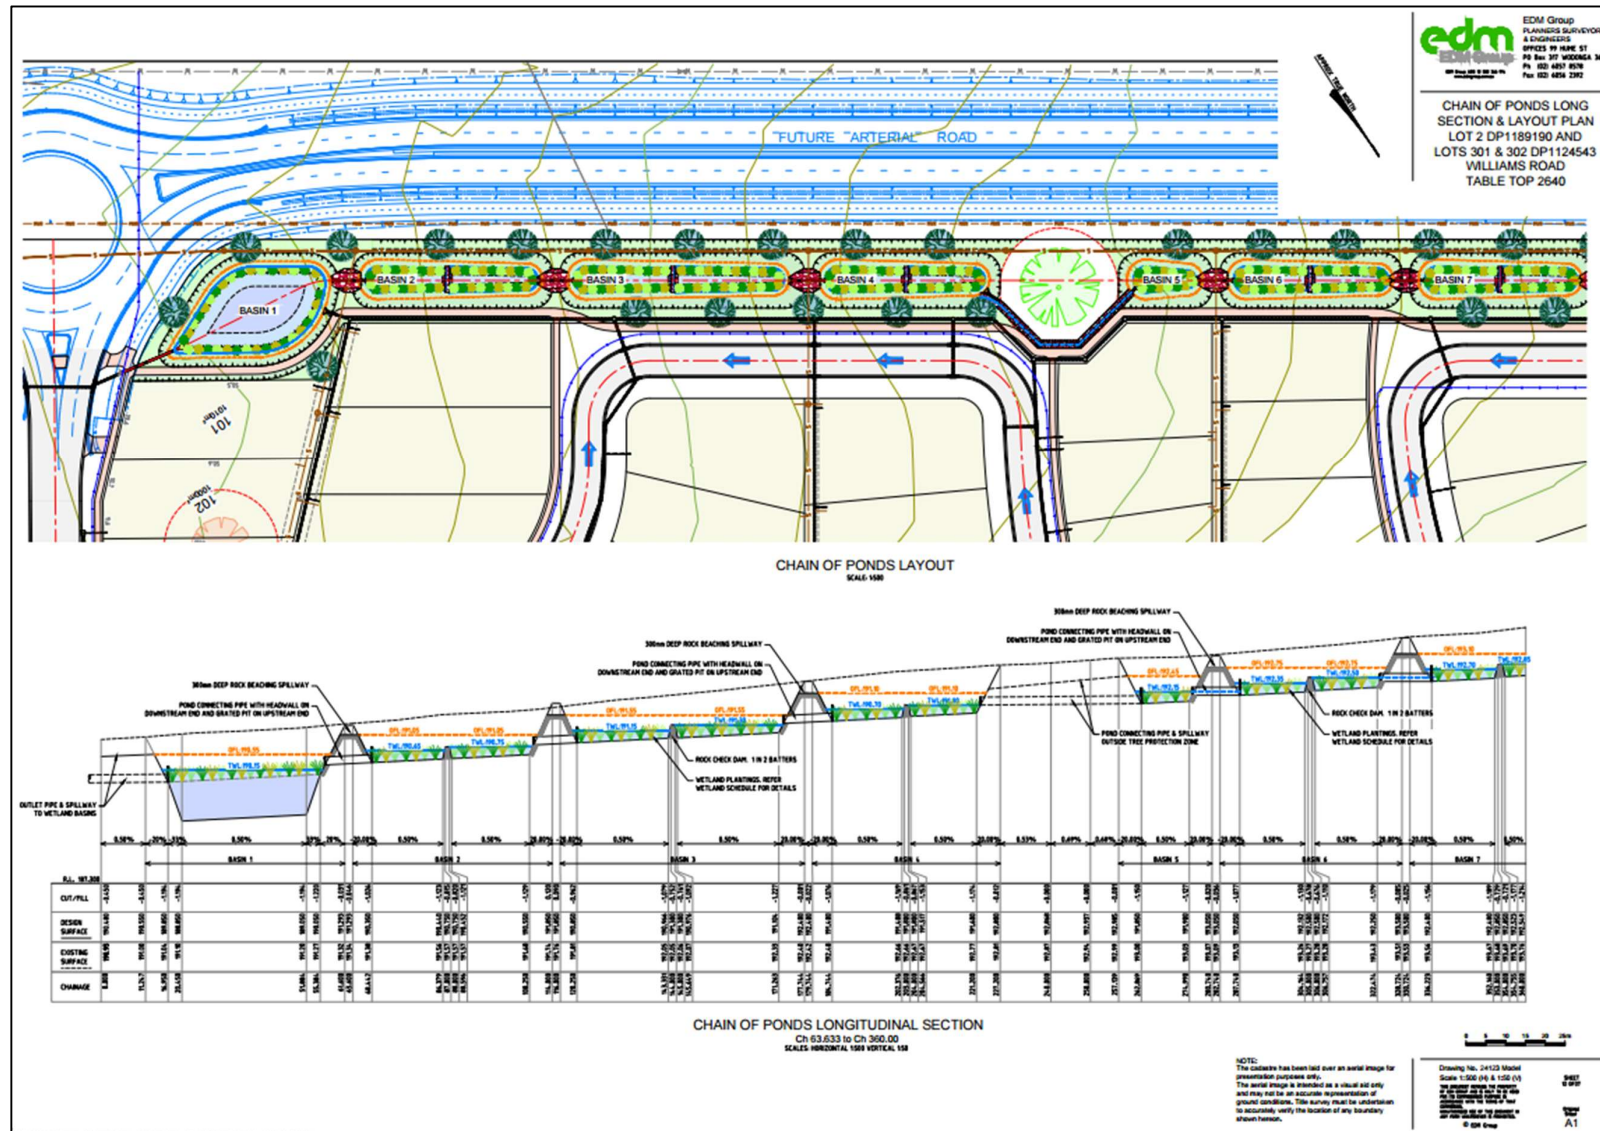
Chain of ponds layout – East section, with cross-section drawings below (Source: EDM
